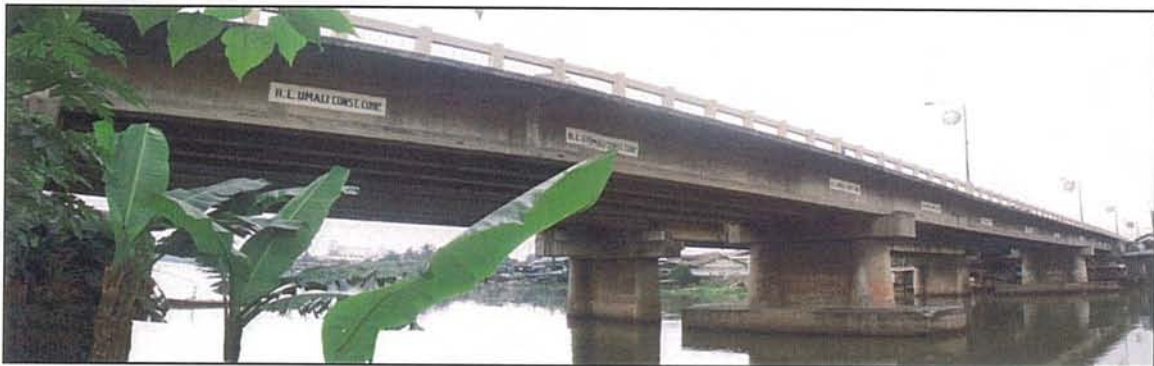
Panoramic View of Vargas Bridge (Upstream)
